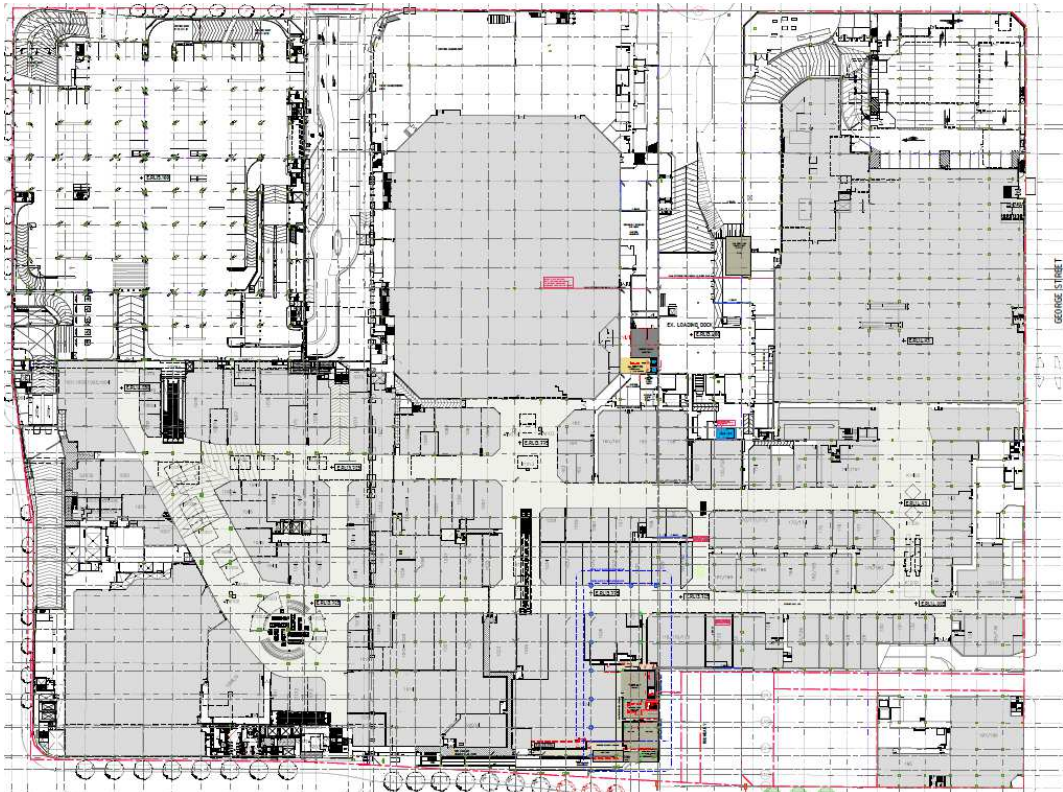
Part Retail Level 1 plan showing the proposed new construction
